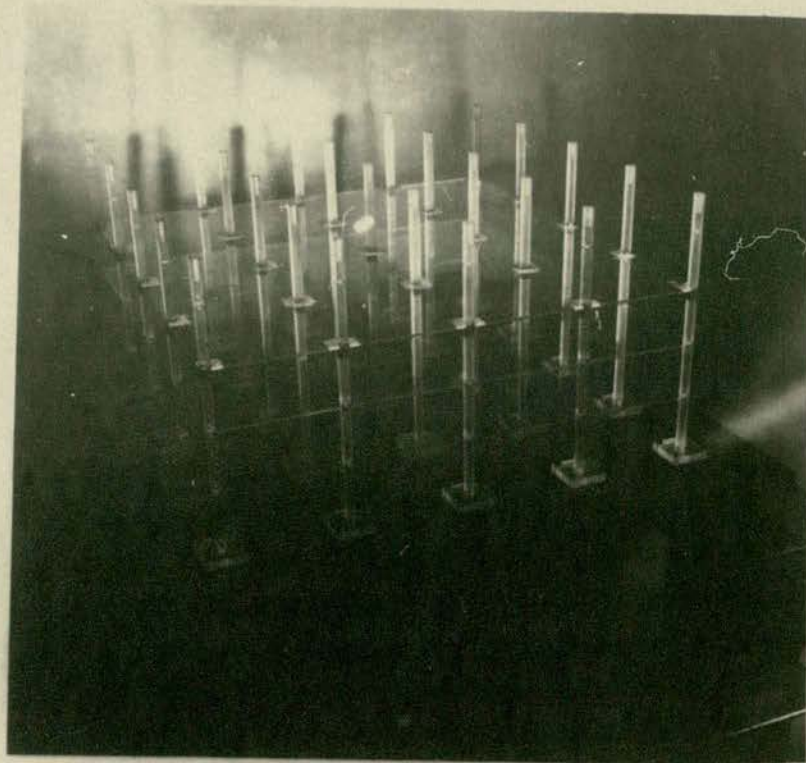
The model in the course of construction showing the third floor slab about to be cemented in position.
